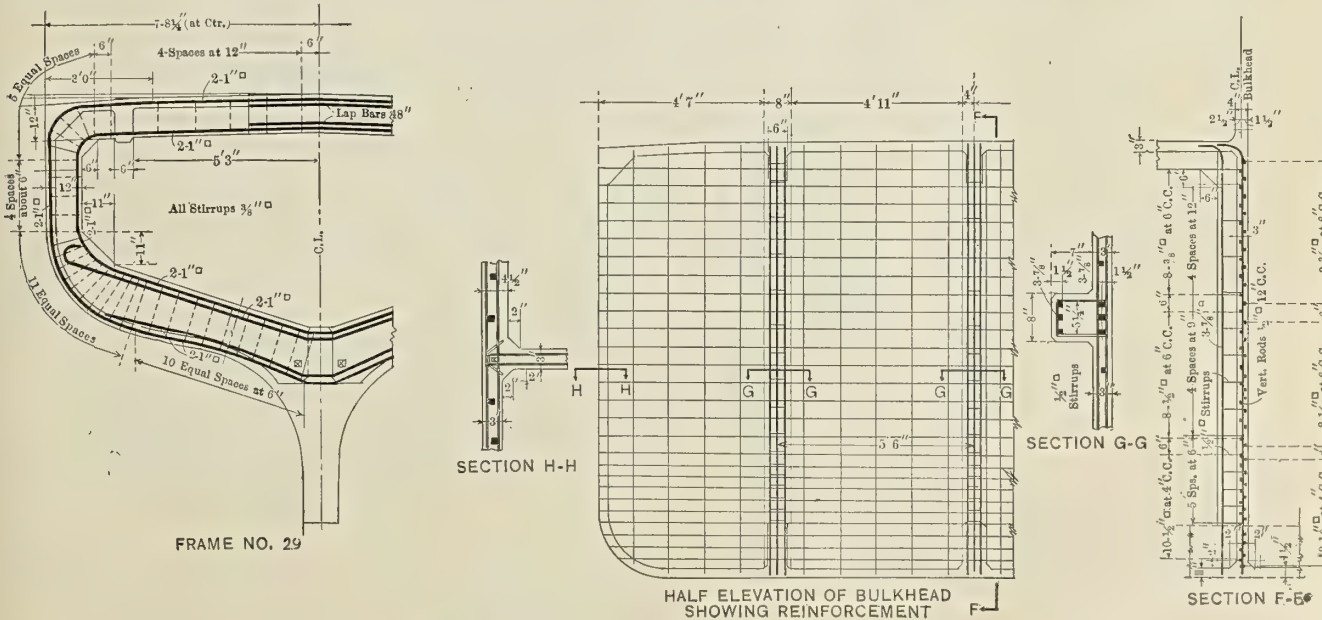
Some Sections and a Half Elevation Showing Reinforcement
